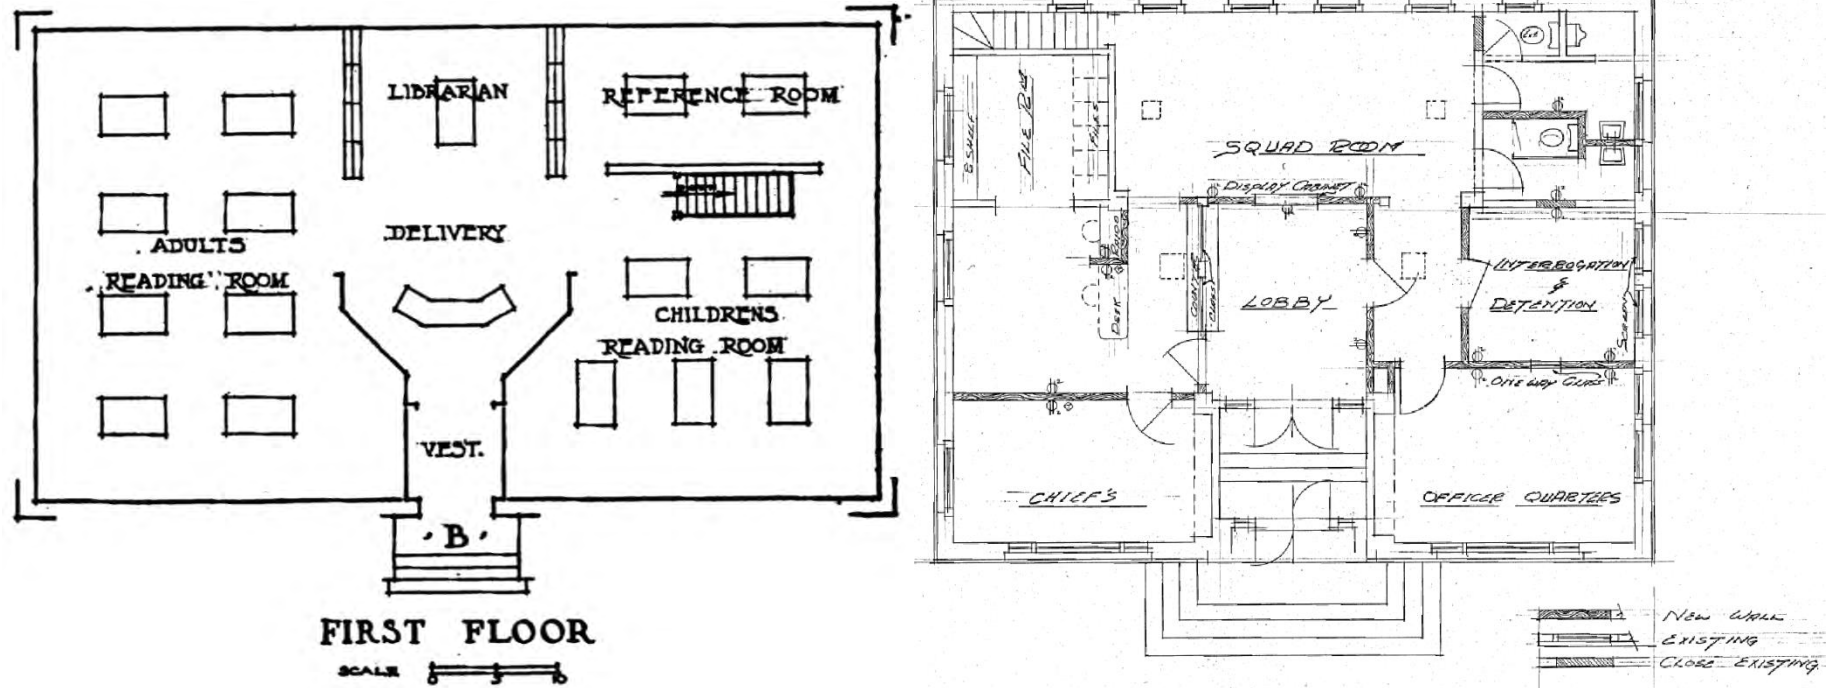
(LEFT): Sketch plan of a typical Carnegie Library floor plan. (Bertram, 3).
